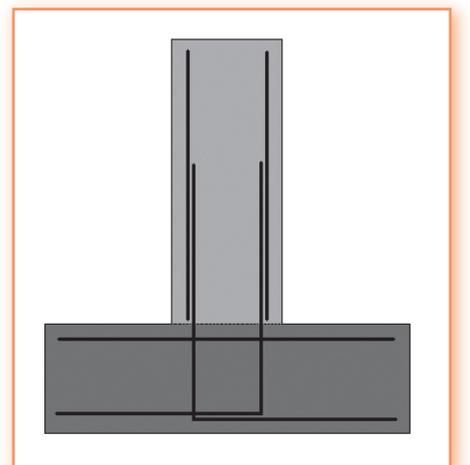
Lap Slices and Cold Joints typical in CIP Construction
